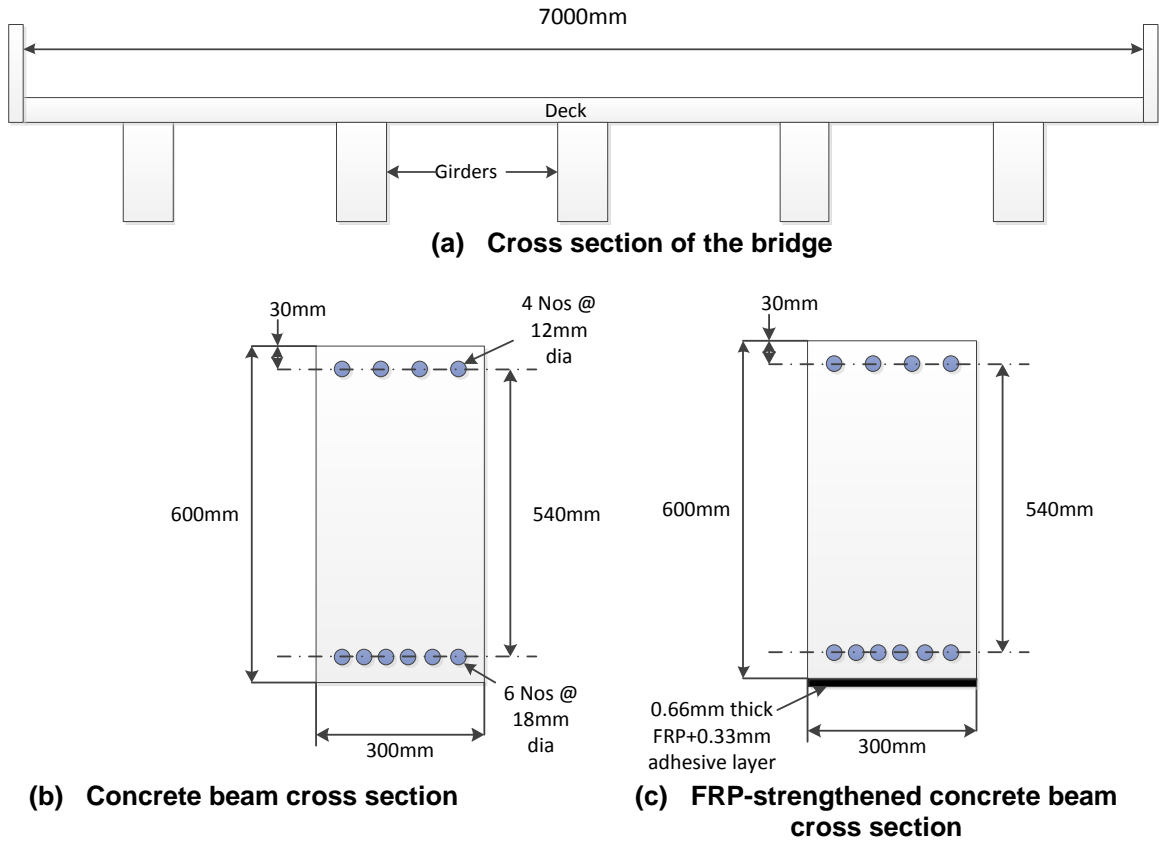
Cross sections of the concrete and FRP-strengthened concrete beams.
